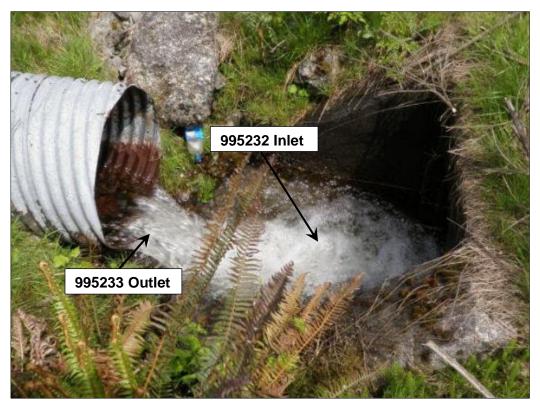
Culvert 995233 Outlet (and Culvert 995232 Outlet) showing a Water Surface Drop and no Deposition (photo taken in 2011 by WDFW)
